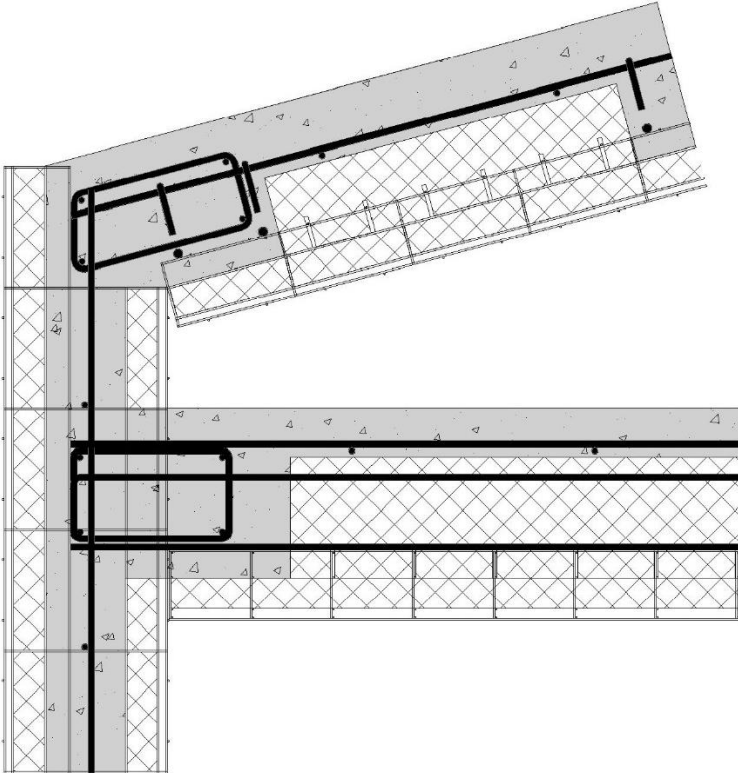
Example of a shuttering floor and roof, including additional rebar
